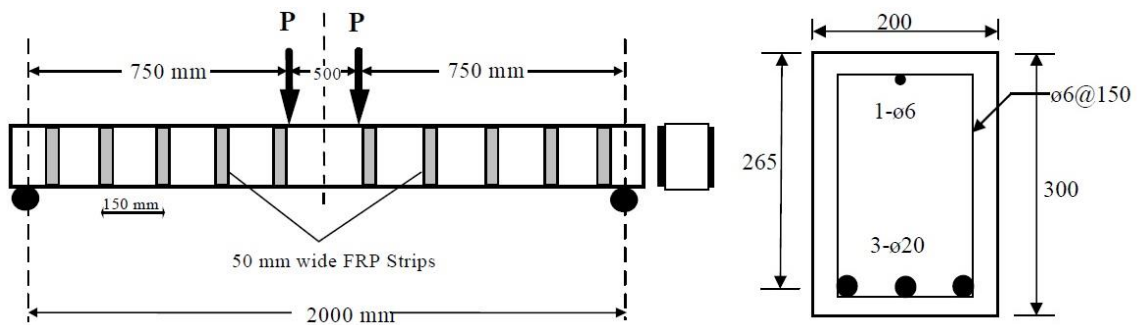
Cross section of Group-2 beam specimens strengthened under scheme-2.
